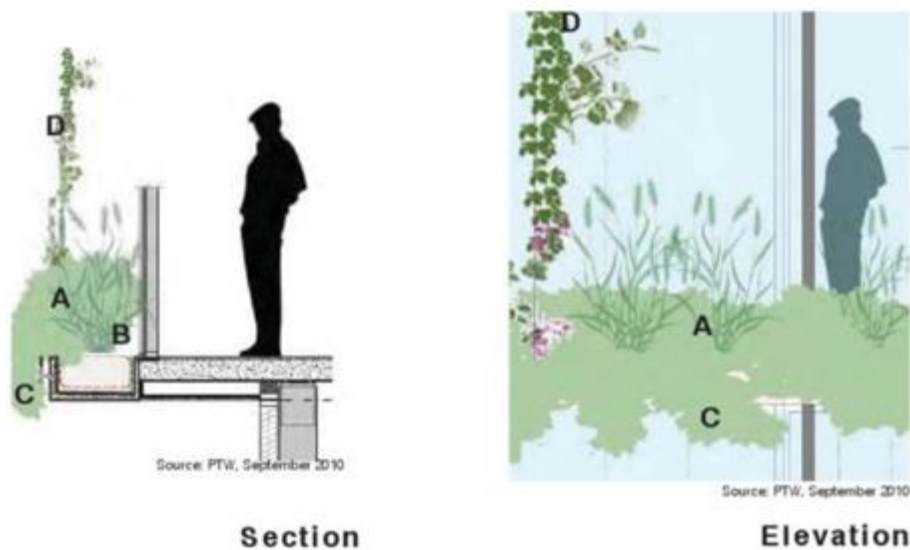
Plant Podiums and Green Wall design of One Central Park; A-Primary Planting, B- ground cover, C- Cascade Plant, D- Climbing (Source: PTW, 2010)
